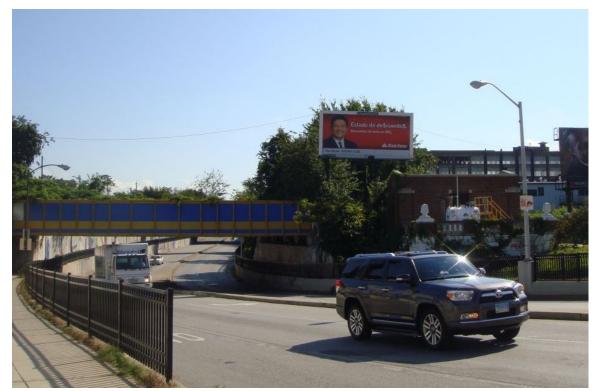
View east toward the alignment and Union Railroad bridge over Eastern Avenue Underpass
